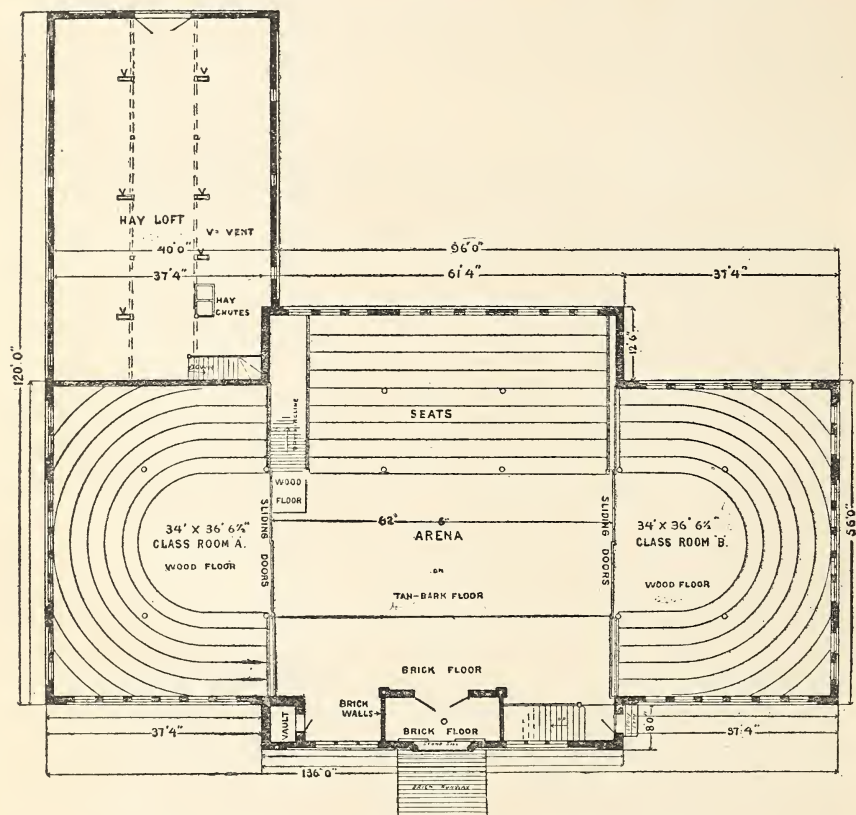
First-floor plan of live-stock pavilion, Minnesota College.
